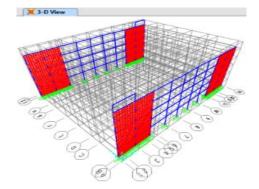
Modelling of shear wall in direction Xi at Y=1, 29.5
